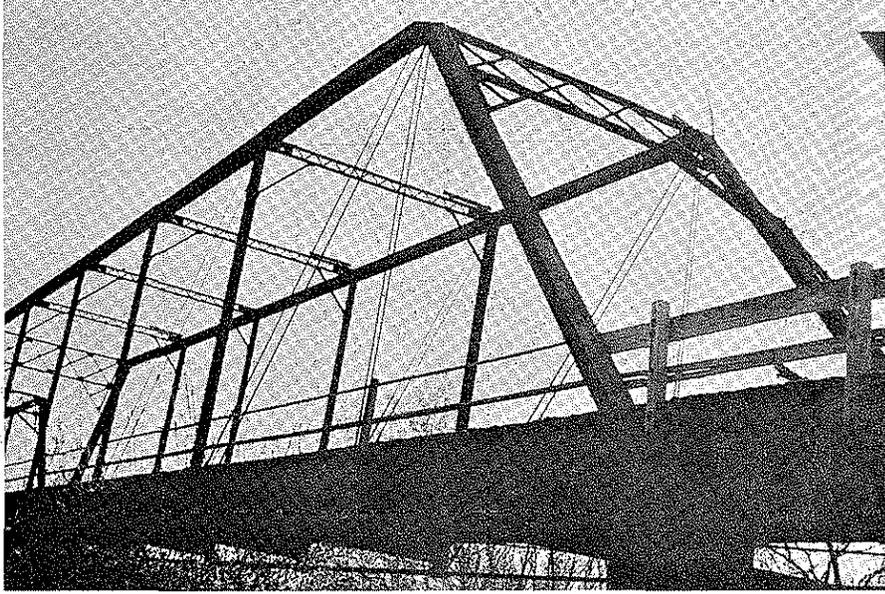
Photograph of Chestnut Ford Bridge (Dallas County) — 150-ft span.
